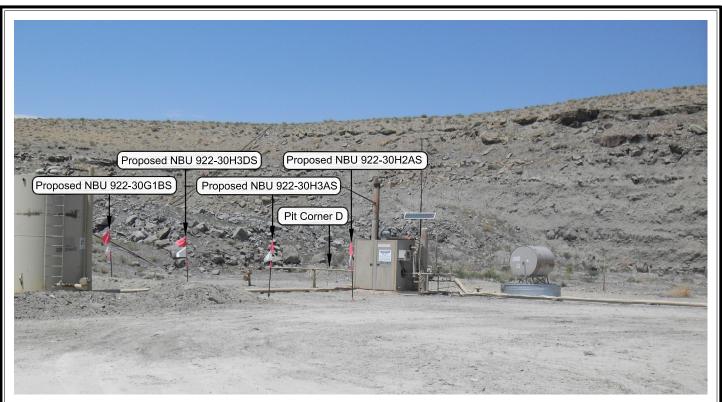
PHOTO VIEW: FROM LOCATION STAKE TO PIT CORNER D
